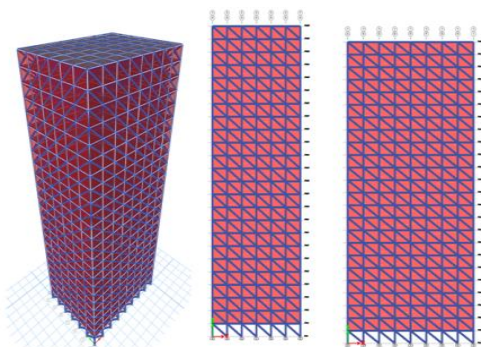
3D view MODEL-II Fig. 1.2b Masonry Infill Walls
